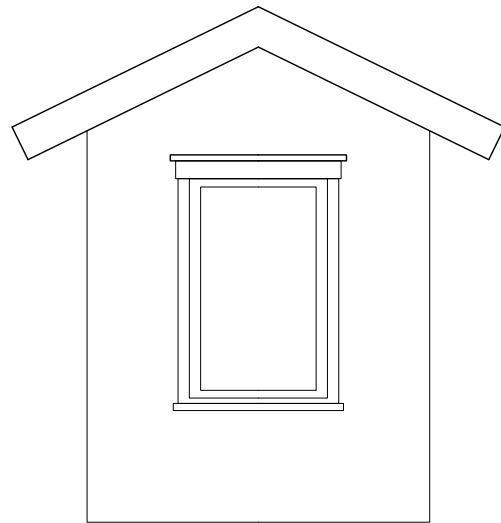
This image shows how building side walls should be treated depending on lot conditions. Buildings that have side walls that are adjacent to publicly accessible space should add detail, glazing or entrances to the side wall to avoid large blank surfaces. Buildings that are adjacent to buildable lots with no side setback may have blank walls in anticipation of future site development.
